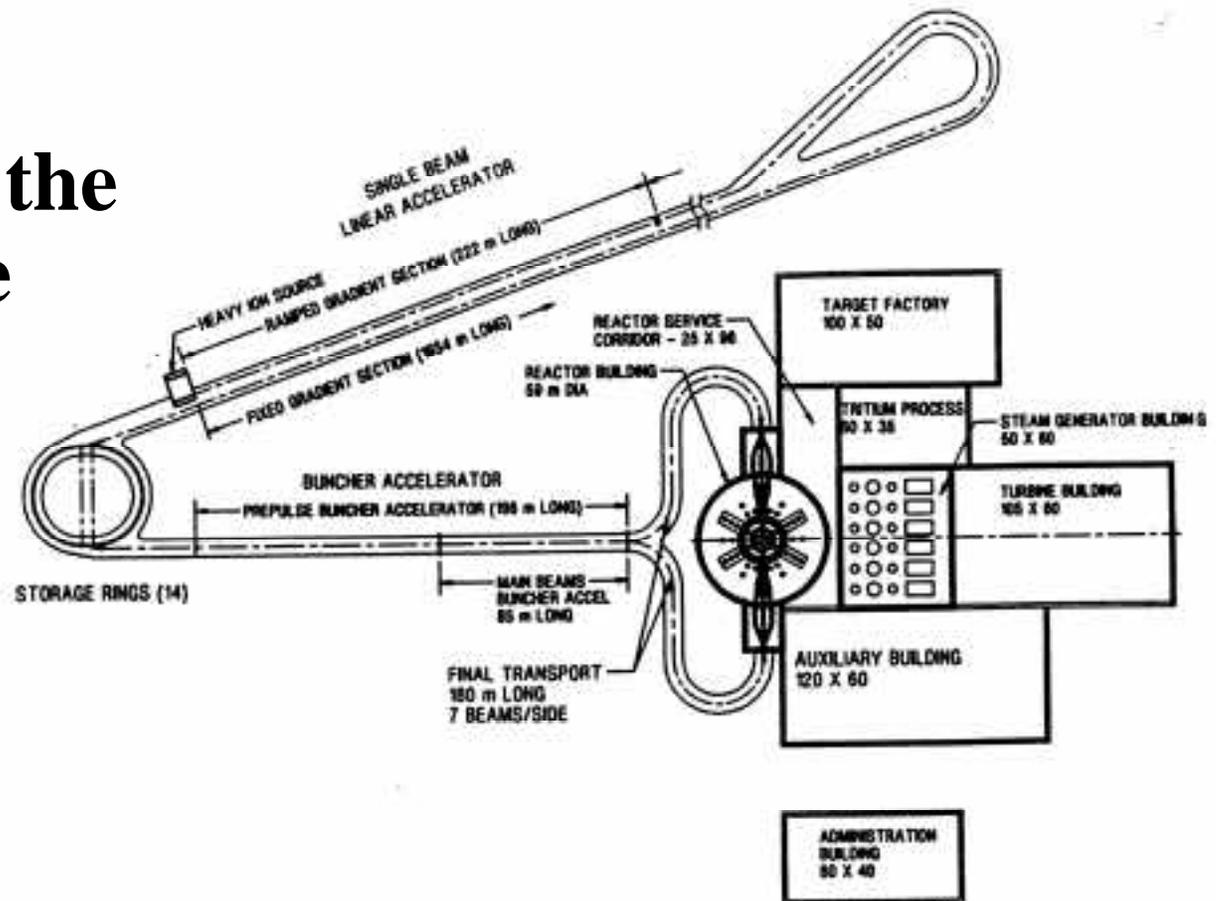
Heavy Ion Reactor Plant Site Plan
